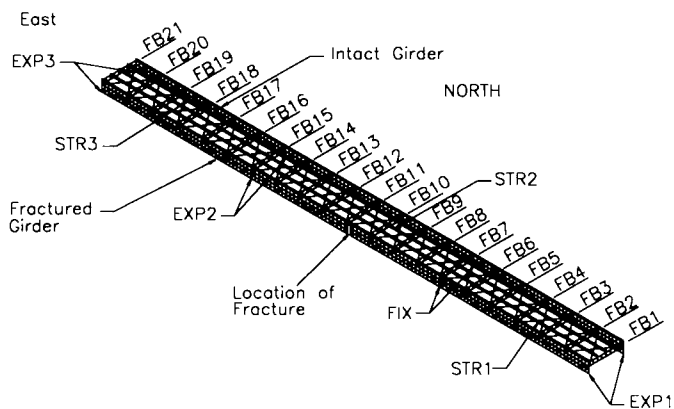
Finite element model of I-40 bridge (below reinforced concrete deck).
